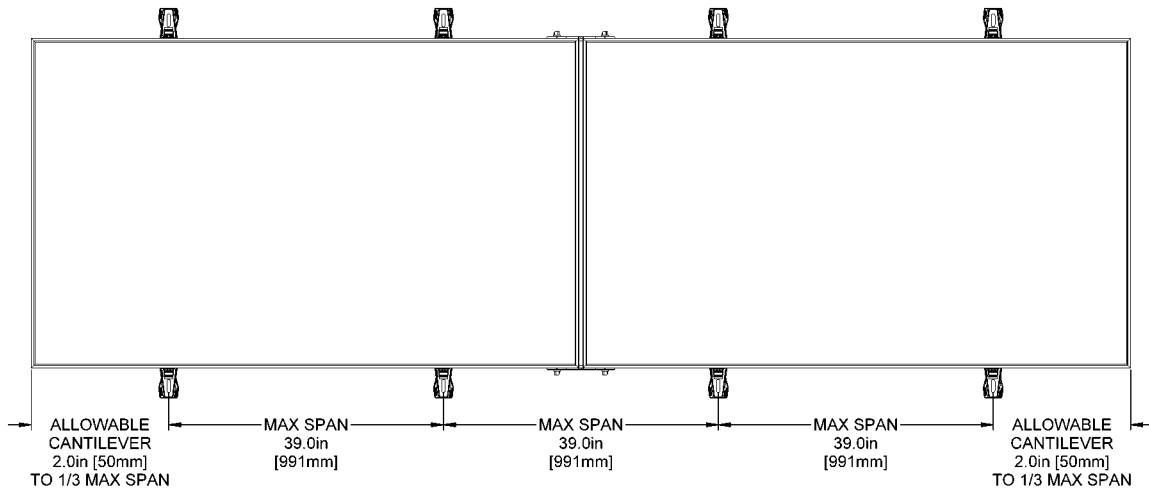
Layout With Leveling Feet, Landscape Example, 112 psf (5400 Pa) Design Load
